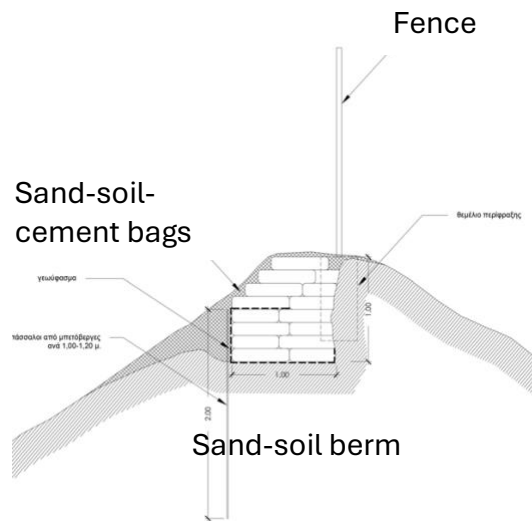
Soil-sand-cement bags stabilizing temporary sea-wall and new fence. November 2025
